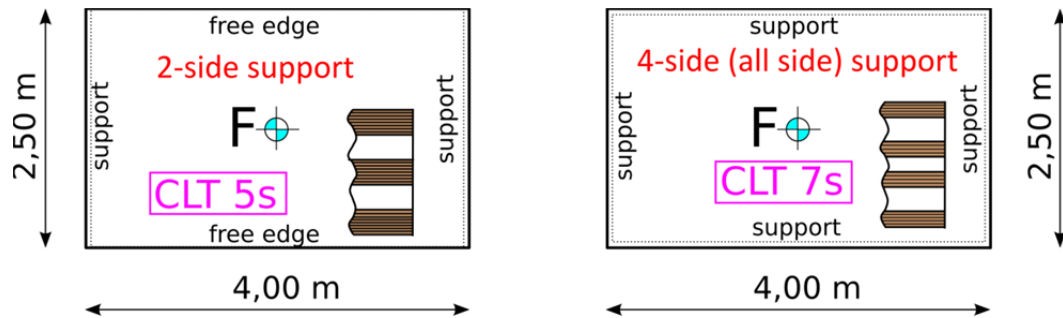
Test specimens for expected bending failure (test configuration 2)
